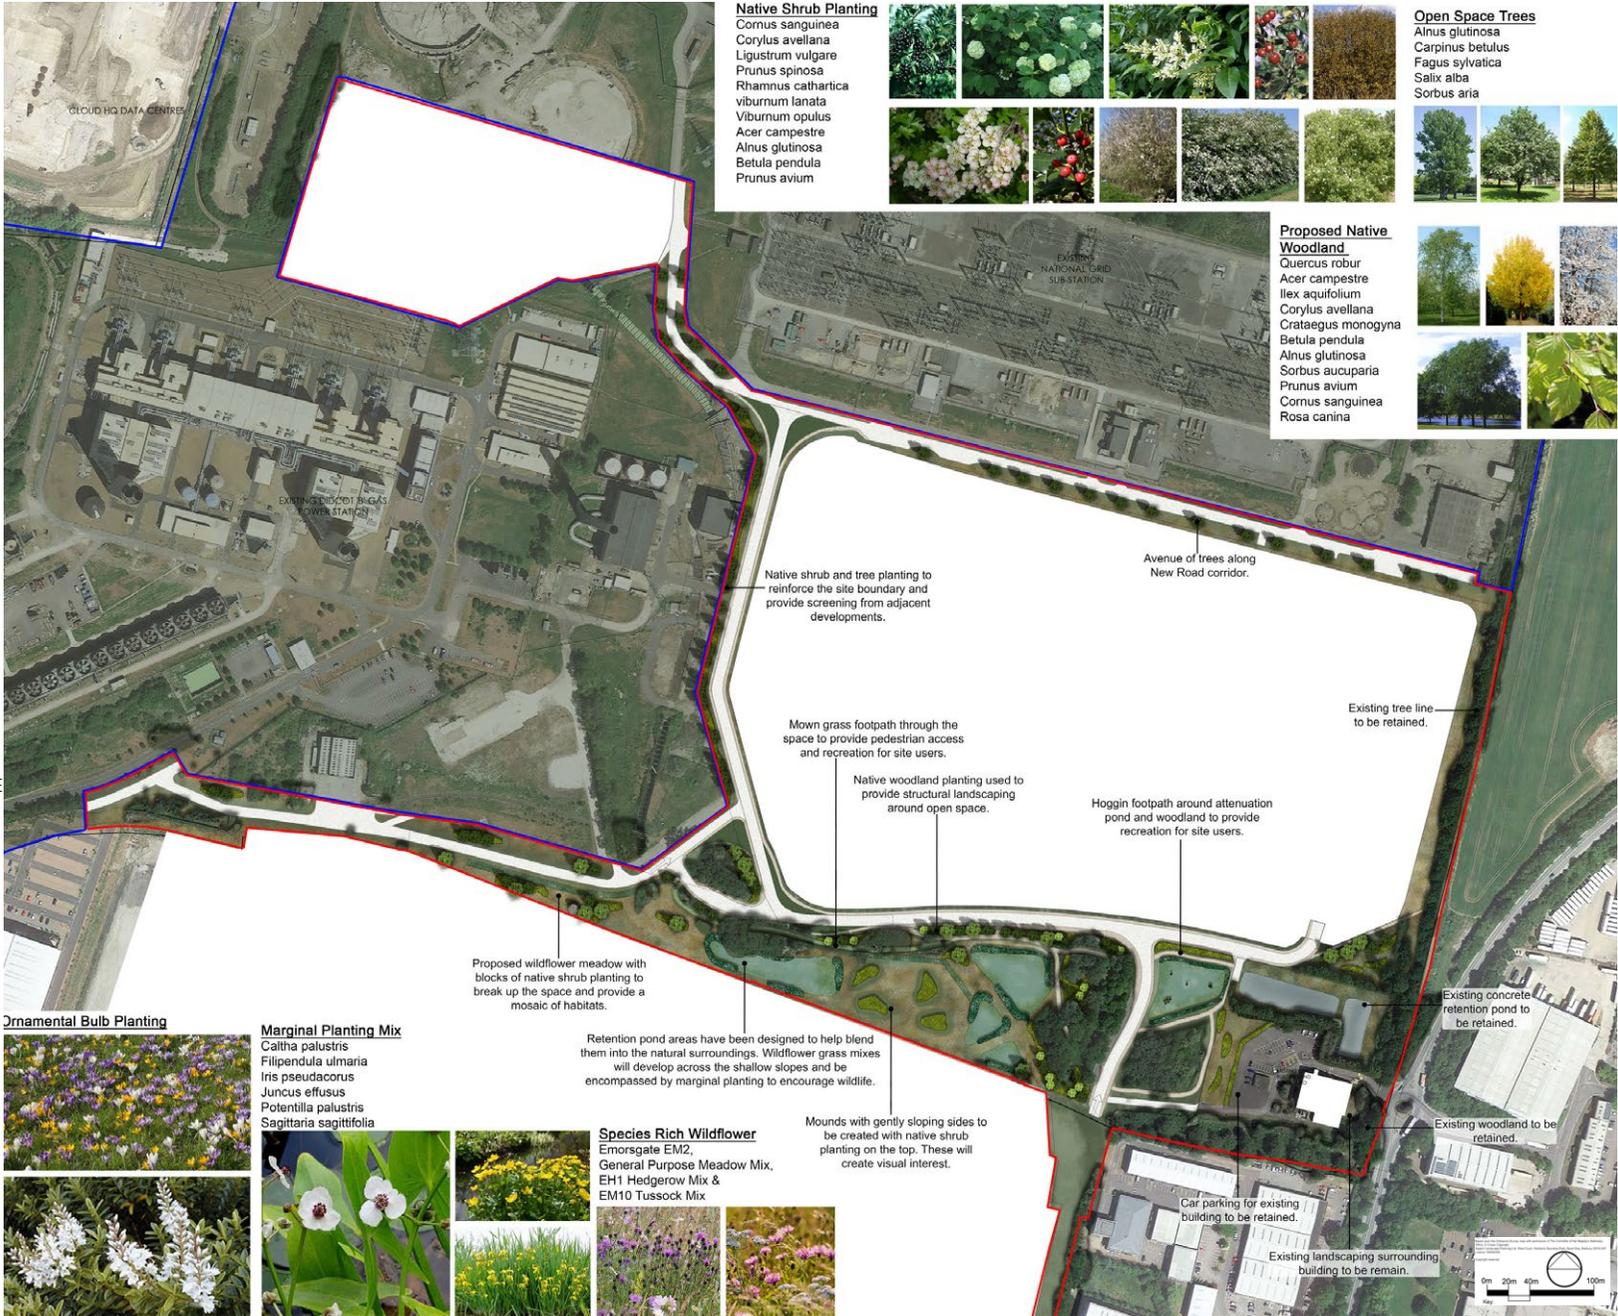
LANDSCAPE FRAMEWORK PLAN
